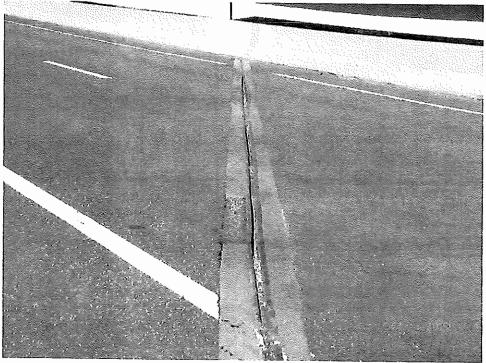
Pier 1 Deck Joint has debris impaction, a patched header, moderate misalignment, and a 3" gap in the north lane.
